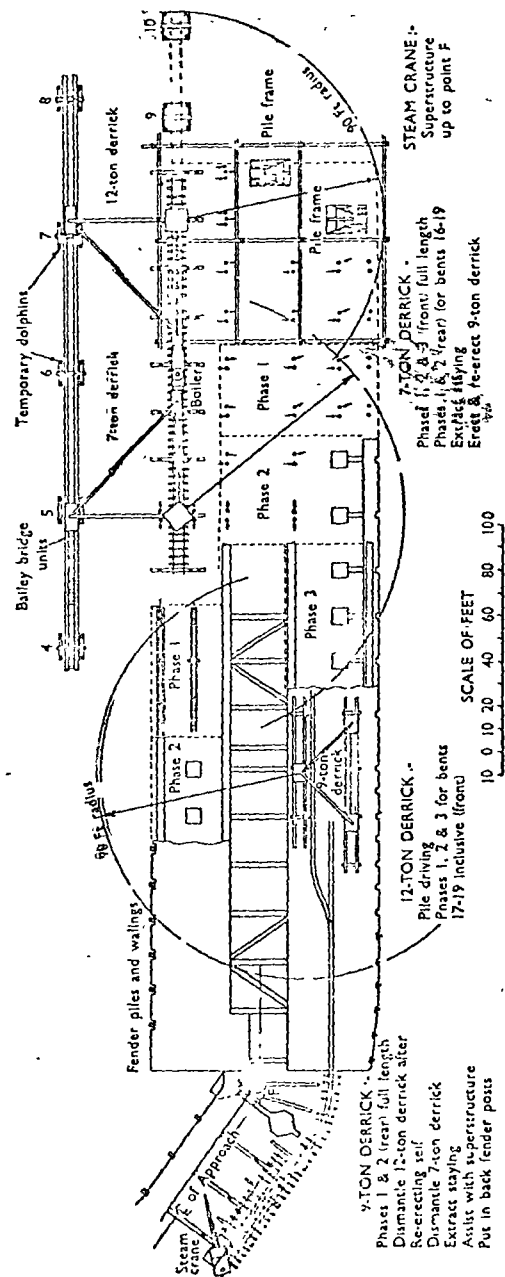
PLANT LAYOUT FOR No. 3 JETTY HEAD
